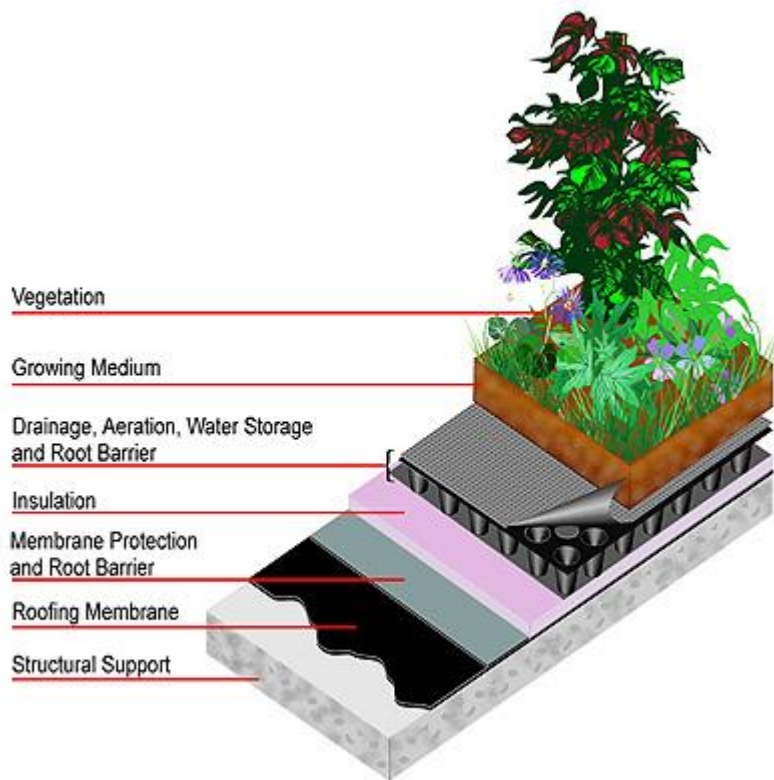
Construction layers of a green roof (American Wick Drain Corp).
